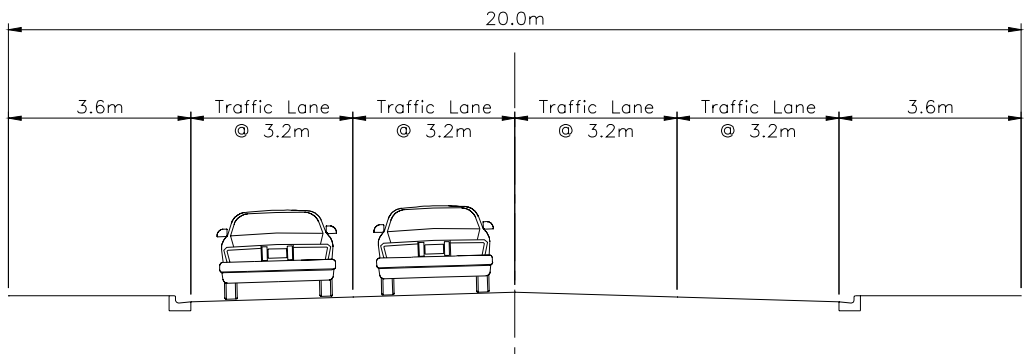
Minimum Cross Section A-A (West of Kinghorne Street)
